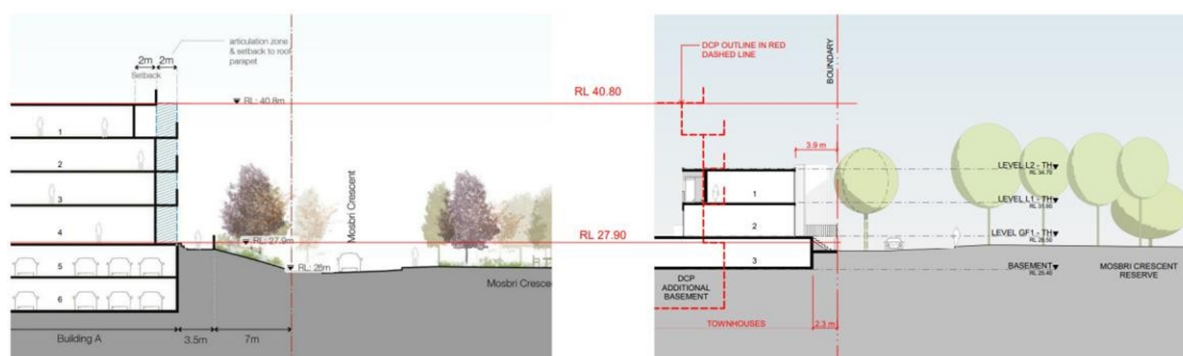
of DCP - Building A Mosbri Crescent (shown left) and proposed cross section (shown right) Figure 5 of DCP - Building A Mosbri Crescent (shown left) and proposed cross section (shown right)
